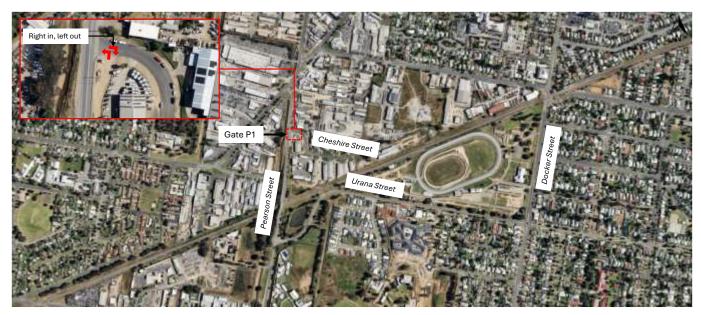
SITE ACCESS DETAILS – GATE P1
